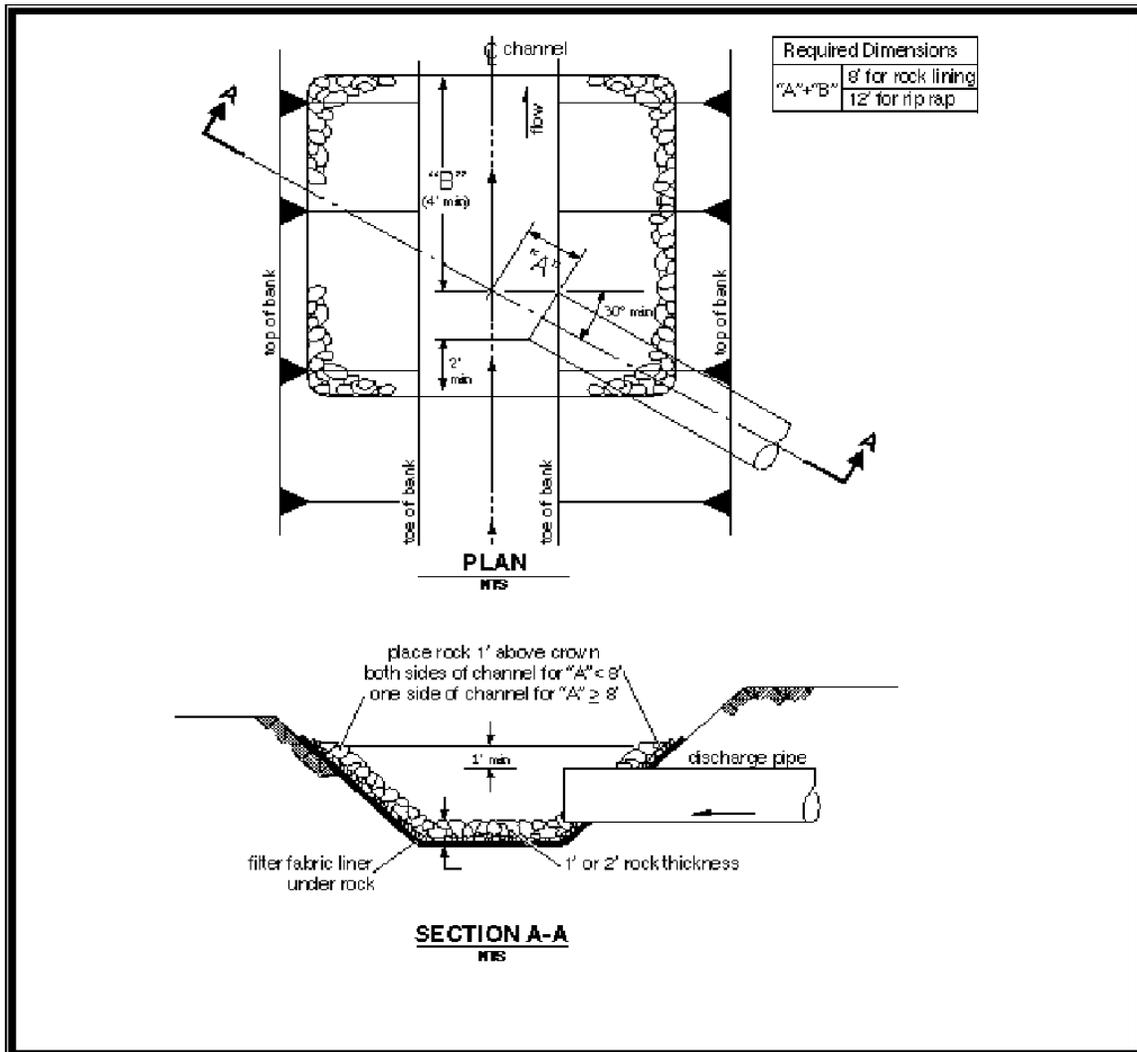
B.1: Pipe/Culvert Outfall Discharge Protection.
